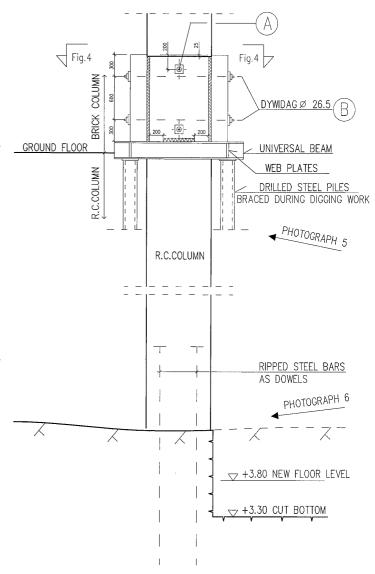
Eastern stair column. Structural stages. Pretensioned concrete mantel and drilled steel piles. Reinforcement concrete column. Levels of rock and blasted rock.
